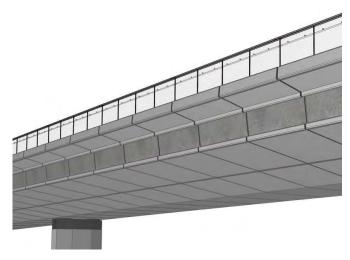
External balustrade Option 1 - frameless glass, 2022.
